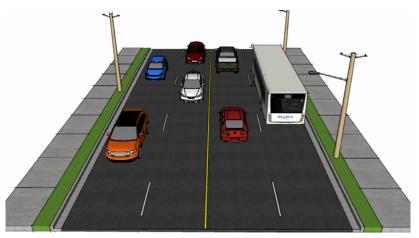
Young Street Cross Section (Windsor to Kempt, looking West)
